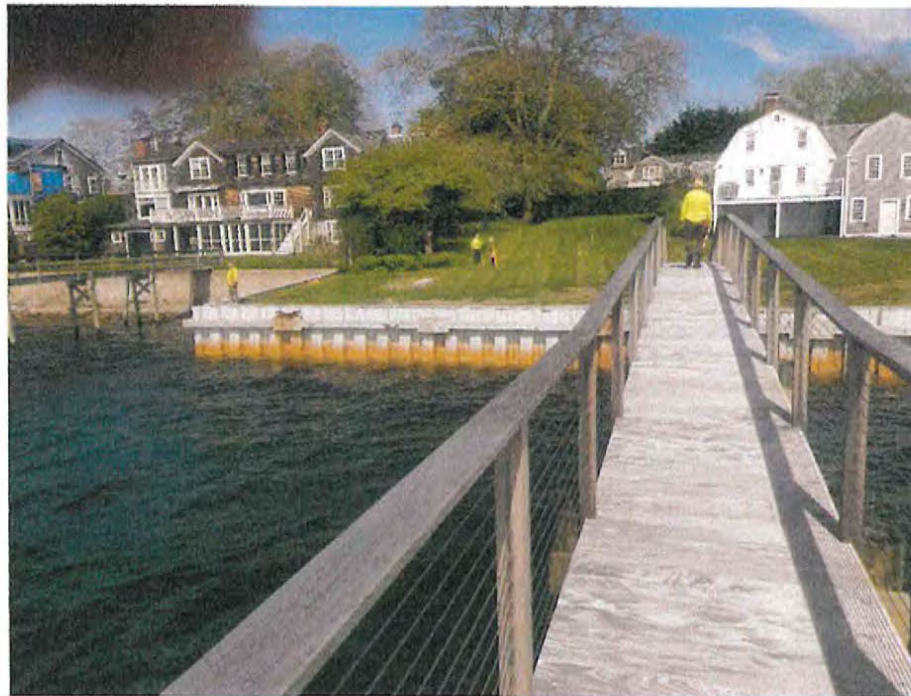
VIEW TOWARDS ROAD FROM DOCK; HISTORIC HOME AT RIGHT.
